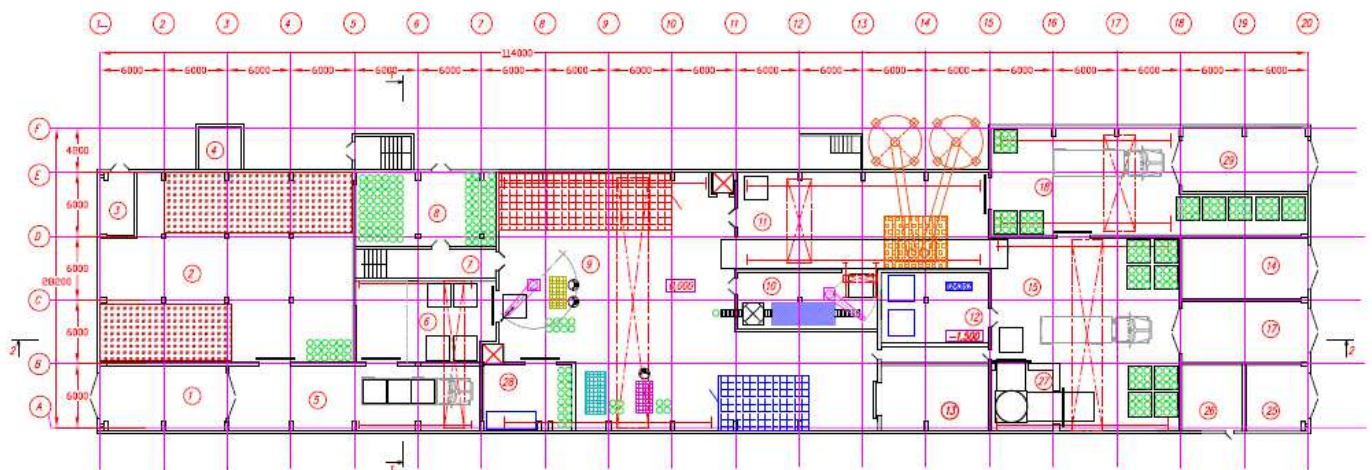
Final design of the layout of the technological building with the equipment integrated into it.
